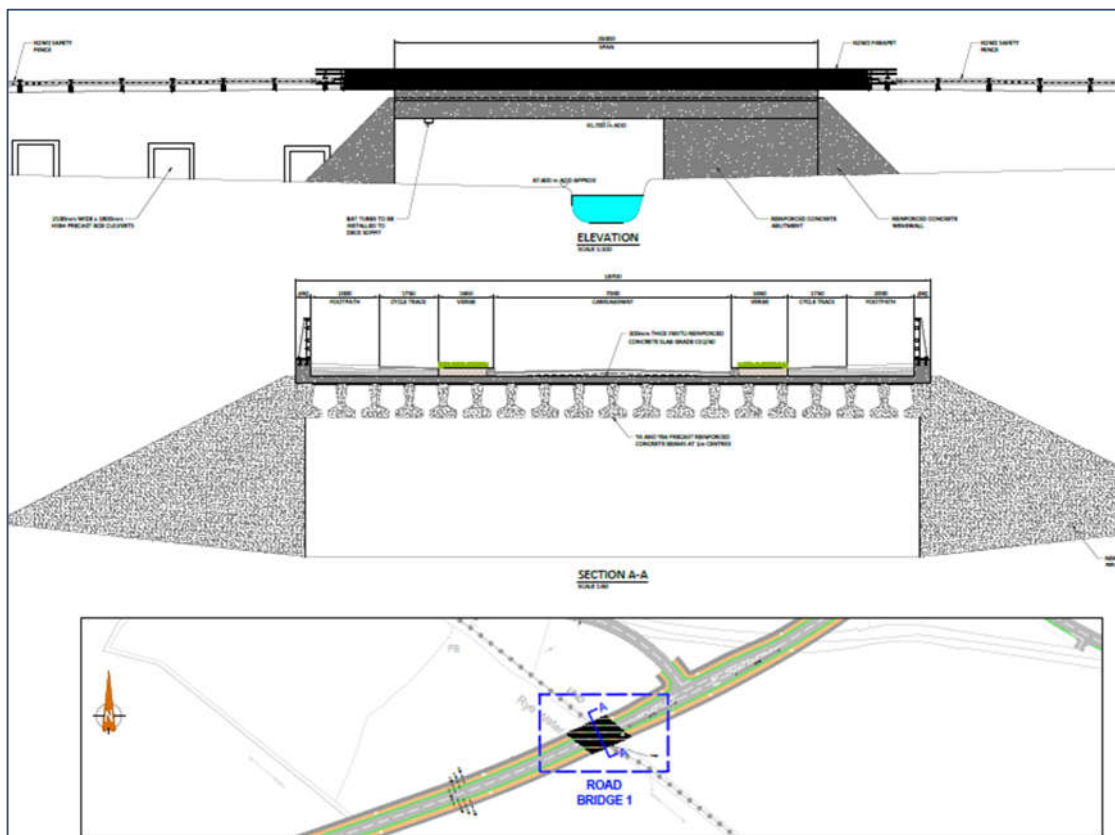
Proposed Moyglare Bridge (Road Bridge 1) – Imagery extracted from Planning Drawings (OCSC, 2022)
